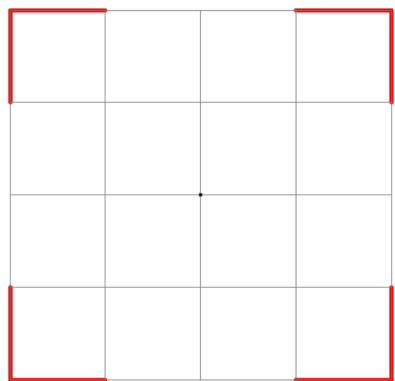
(a) Structural Plan for Inverted V-braced RC Frame (Model-5)
